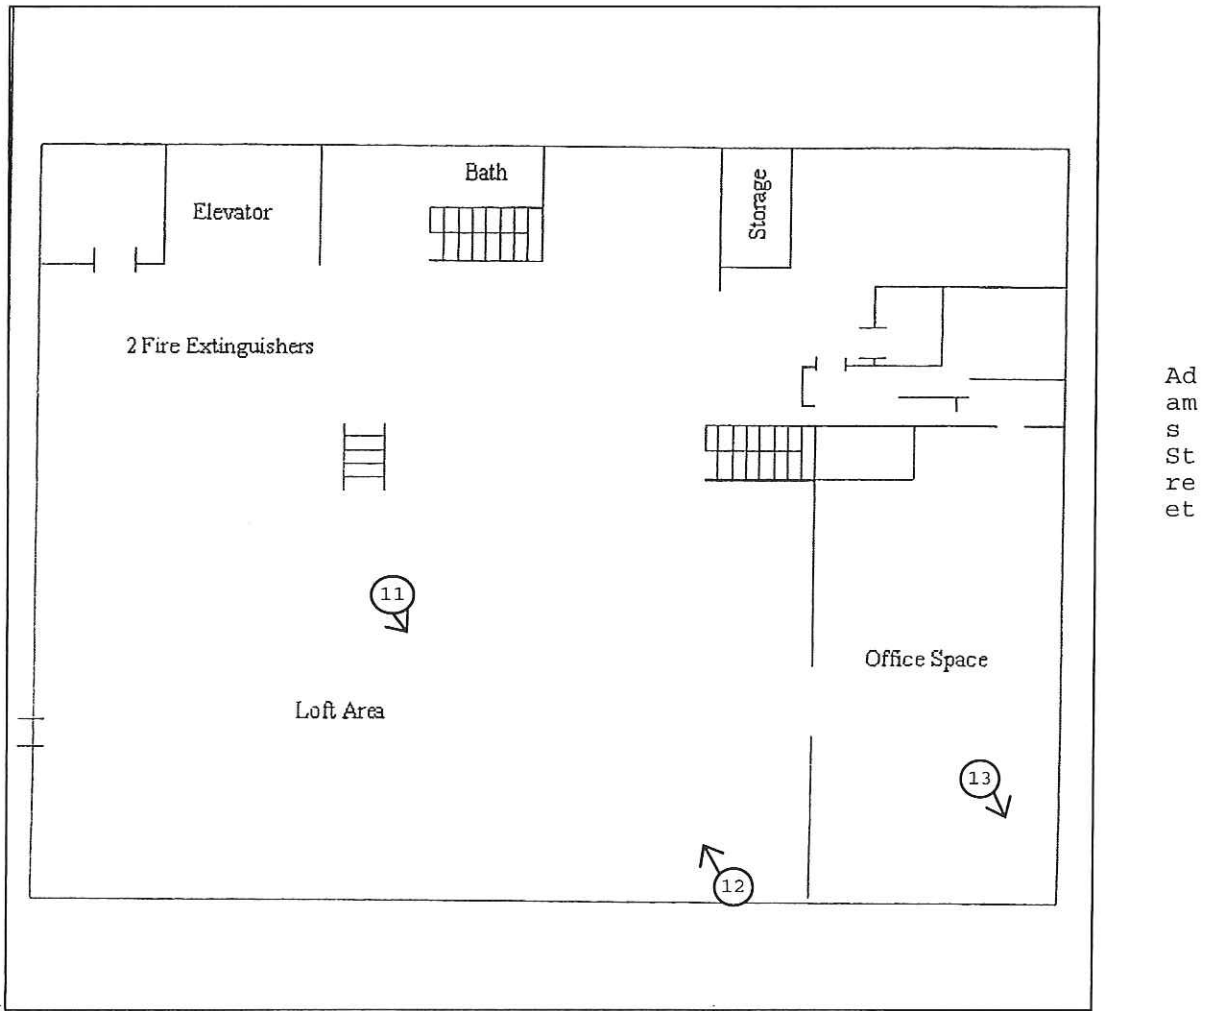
Second Floor Schematic Plan showing locations of photographs 11-13
